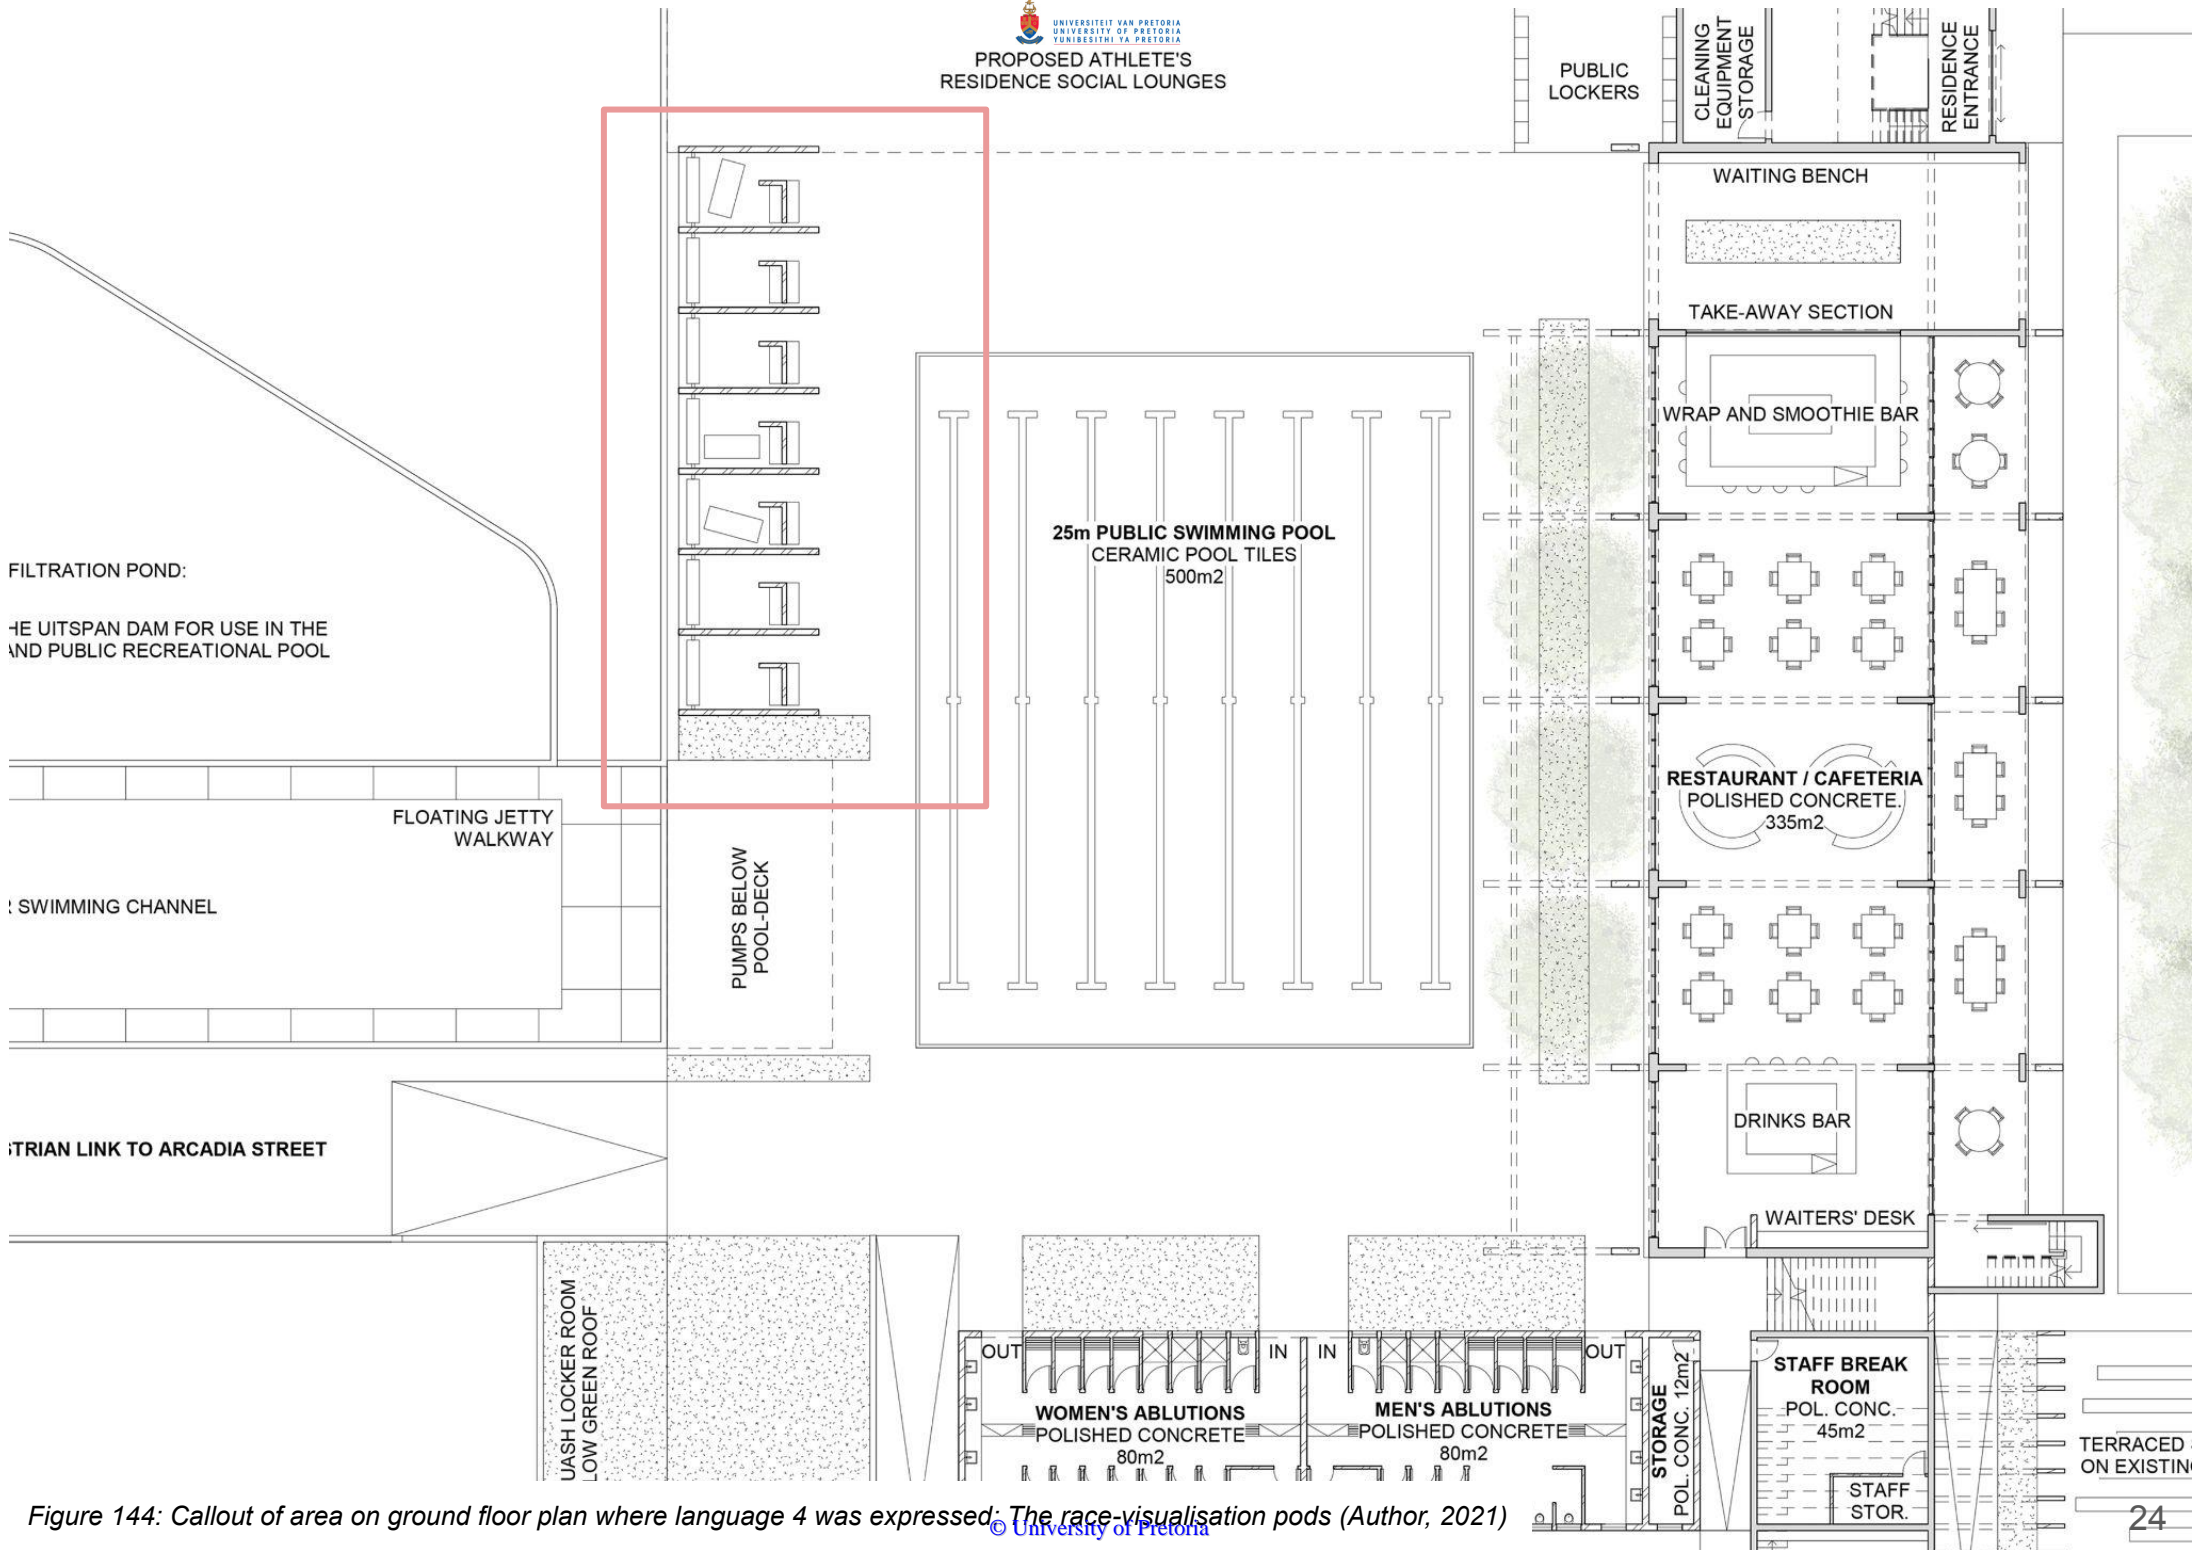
Callout of area on ground floor plan where language 4 was expressed: The race-visualisation pods (Author, 2021)
